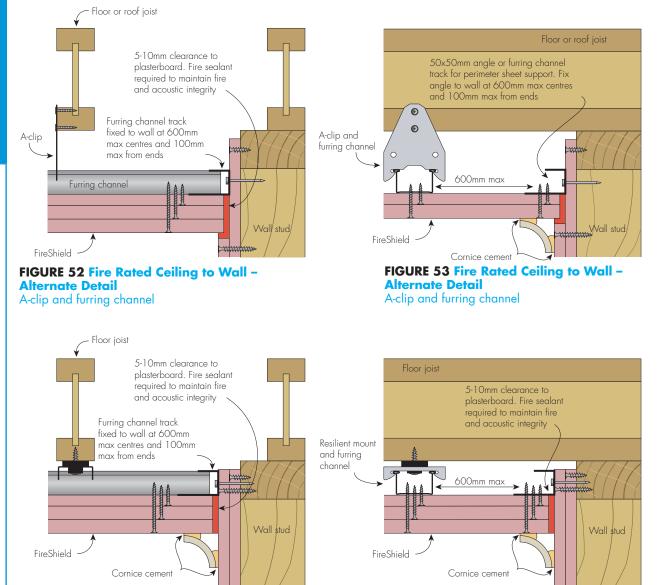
Fire Rated Ceiling to Wall Resilient mount and furring channel FIGURE 55 Fire Rated Ceiling to Wall
